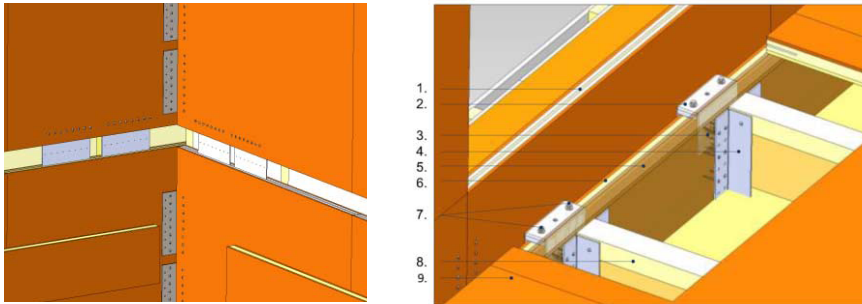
External wall-to-wall connection interface with slotted-in steel plates and screw connectors: (a) Steel plates used for horizontal and vertical connections between wall elements and (b) Detail of connecting elements vertically and use of hard fibreboard strips instead of timber rails.
